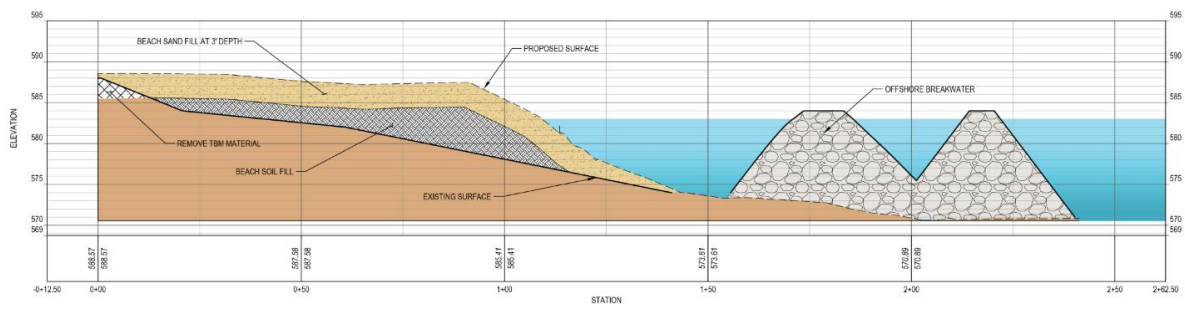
Alternative 3 Beach and Detached Breakwater Cross-section
